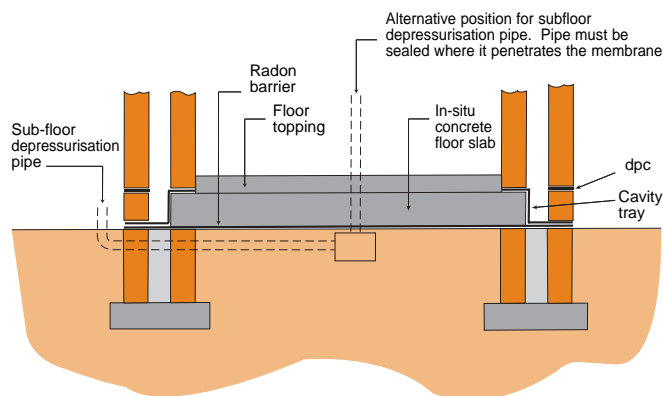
Figure D: Full radon protection for an in-situ or ground-supported concrete floor (barrier under slab)
